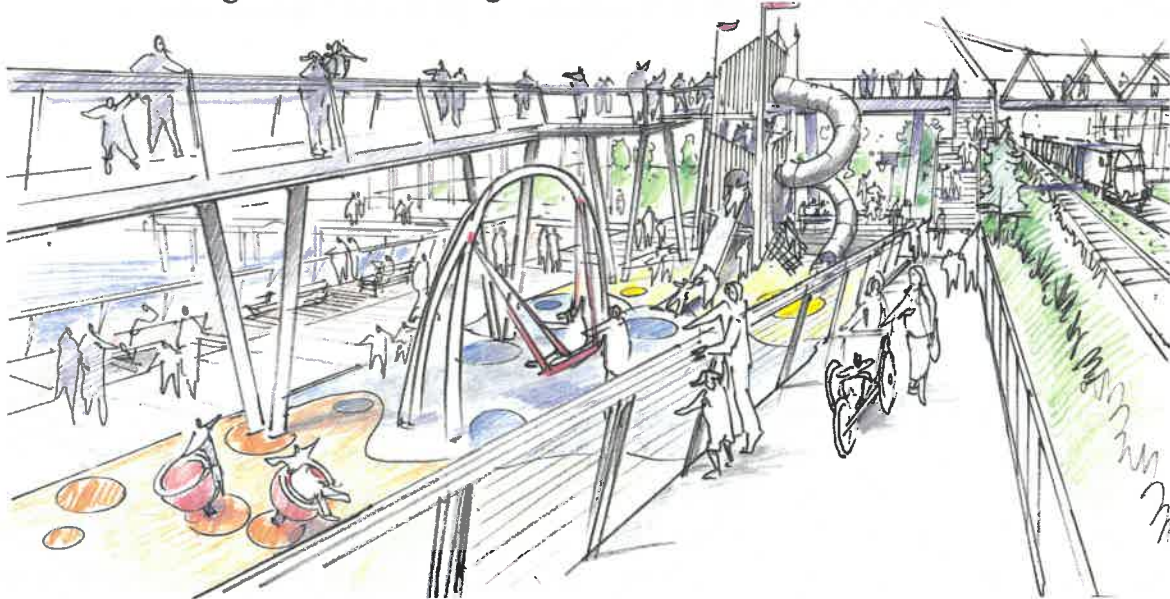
Artistic sketch rendering of the proposed overpass, ramp structure and renewed adventure playground conceptual design.
